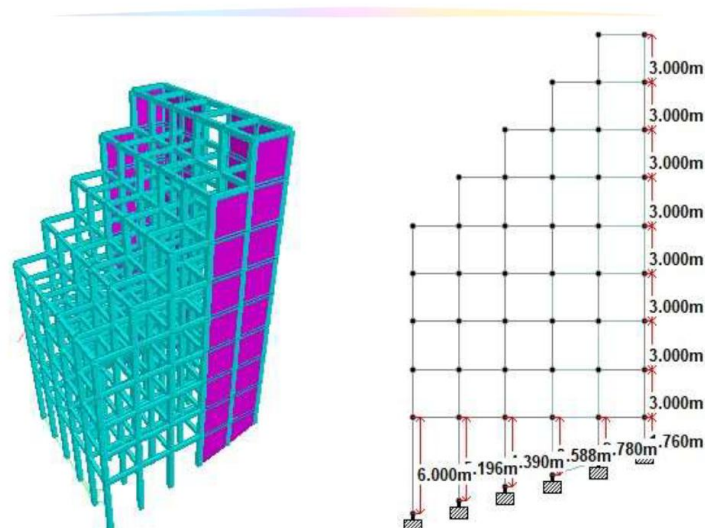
Elevation of L Shape Shear Wall with 15° Slope
